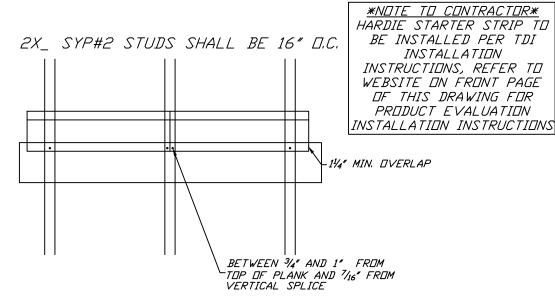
DETAIL FOR HARDIEPLANK 81/4" SIDING (CONCEAL NAIL METHOD INTO PLYWOOD)
